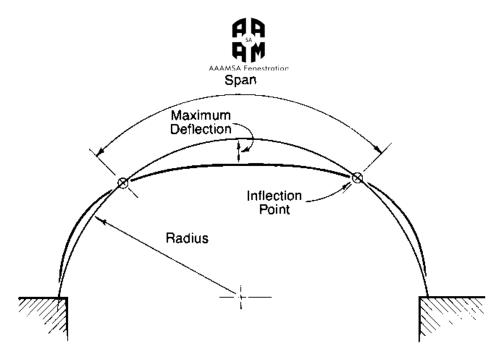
Arched Frame Deformation under Gravity Loads
